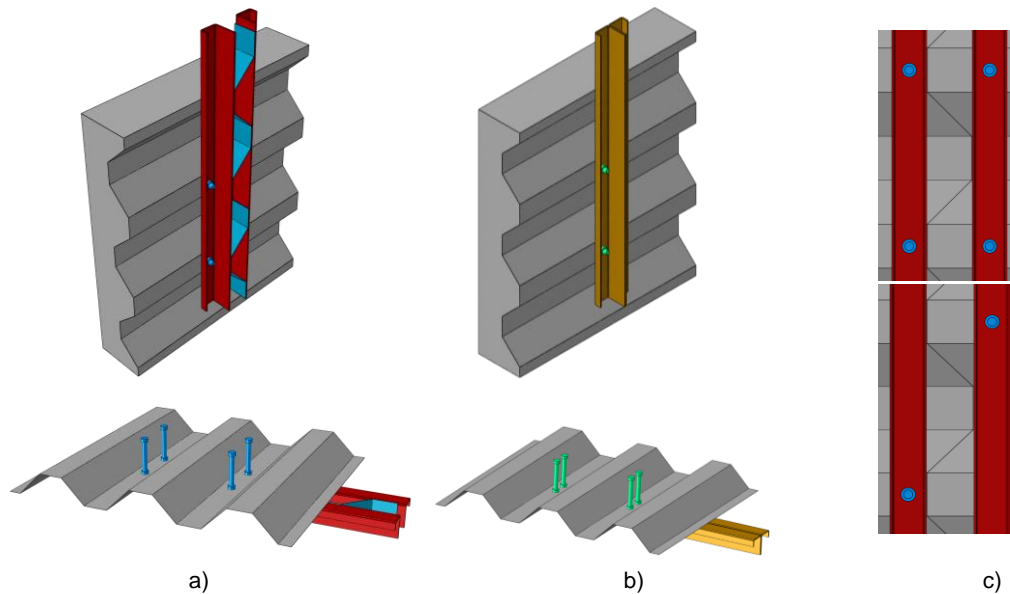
Finite element models of specimens with bolted shear connection: a) with corrugated web (MW and S models); b) without corrugated web (M models); c) position of bolts (pairs and staggered)
